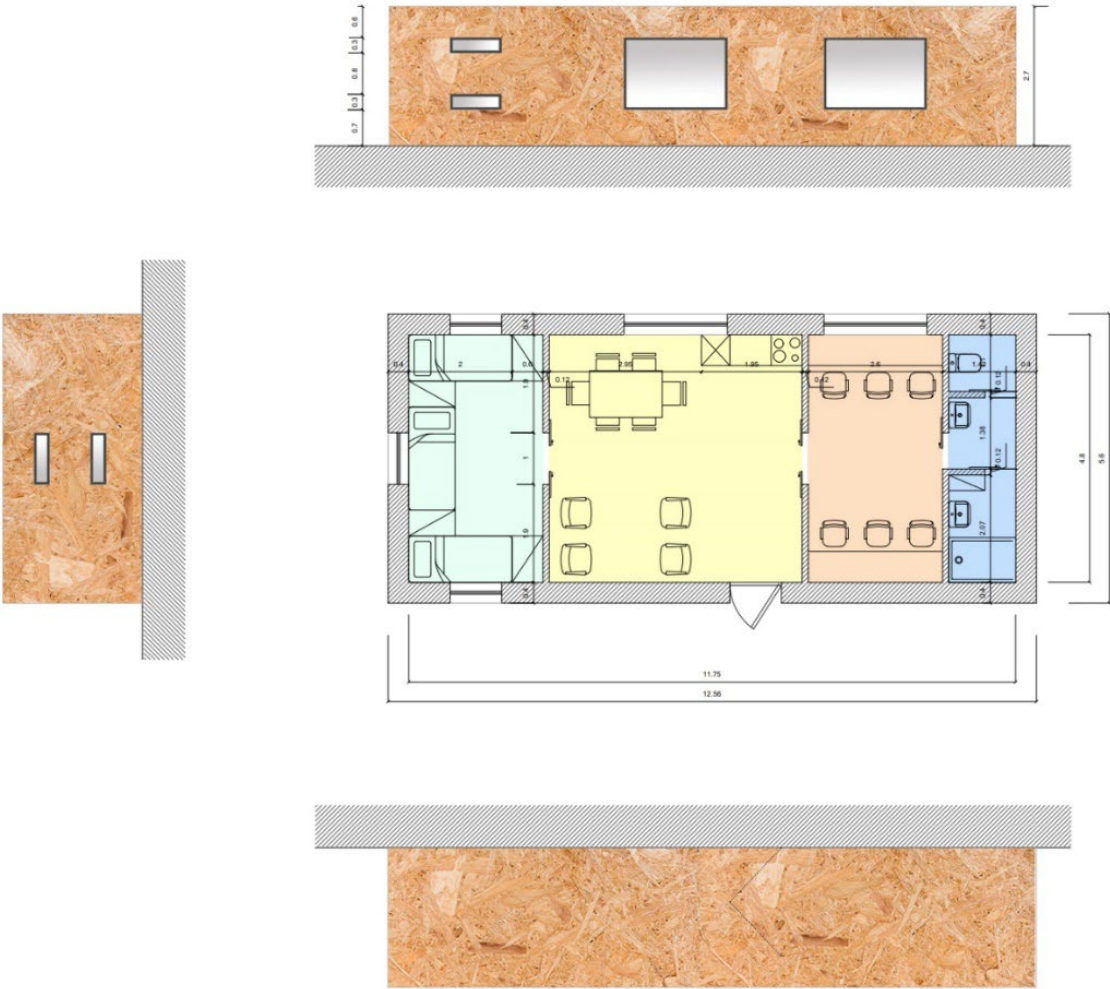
Floor plan and elevations of the prismatic proposal of a habitat for extreme environments, using a wood derivate material such as OSB panels for the walls.
